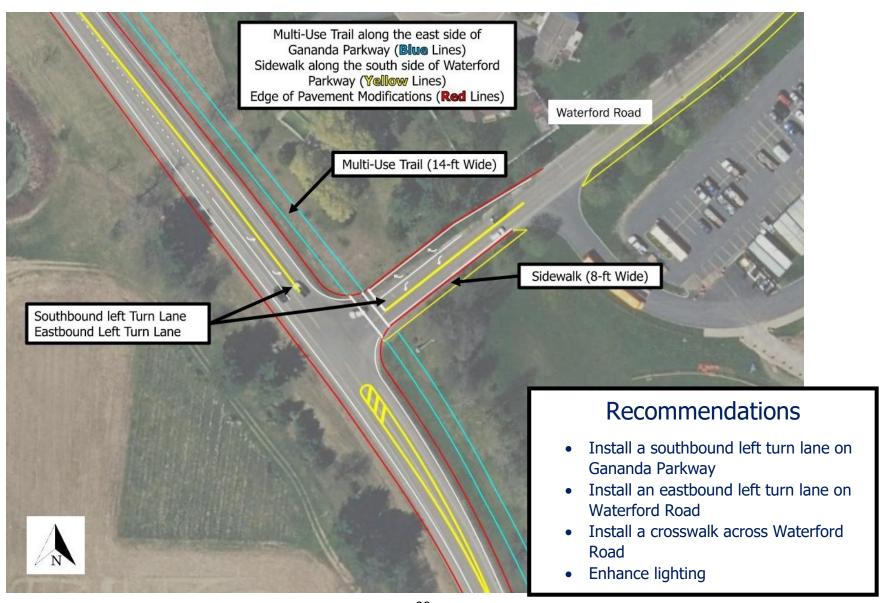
Gananda Parkway Segment 4 (Canandaigua Road to Waterford Road) - Waterford Road
